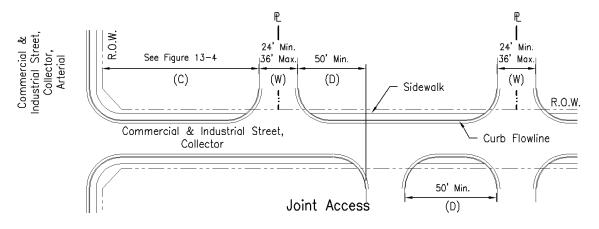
CURB OPENINGS AND DRIVEWAY SPACING
